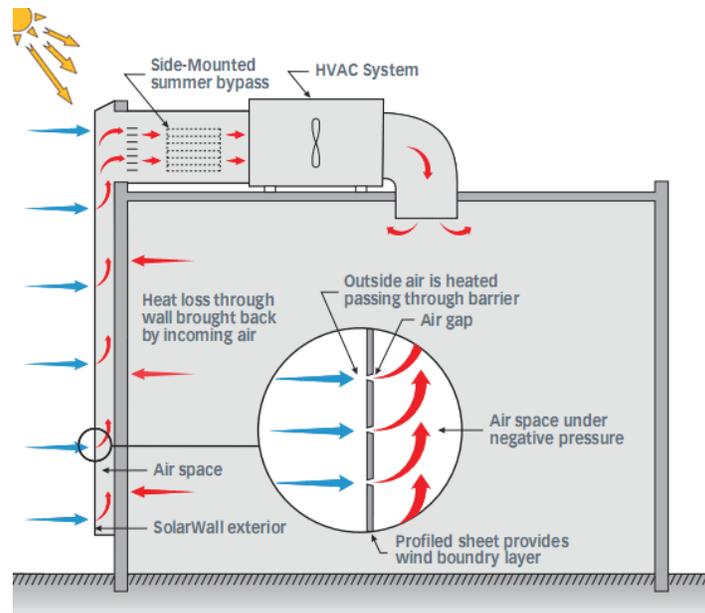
Solar Ventilation Air Heating Diagram -SolarWall®
